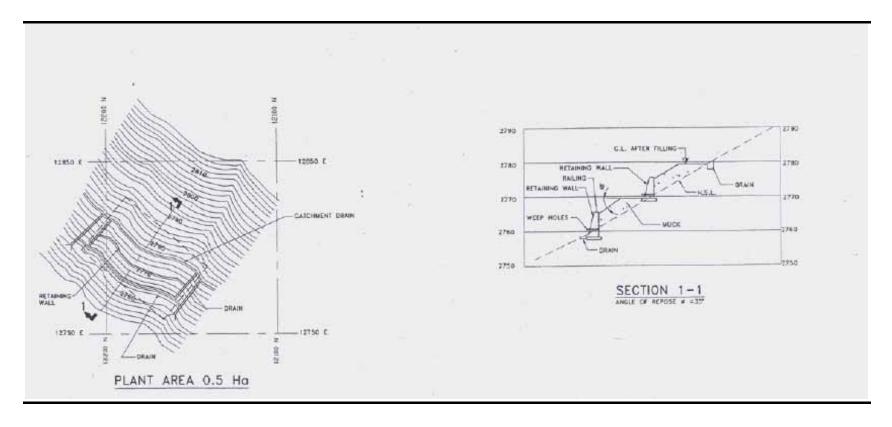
Plan and section of Plant Area (PA-1e) near Duhangan Adit –I showing muck disposal arrangement (Plant Area 0.5 Ha 12000 m3 of Muck Reuse)
